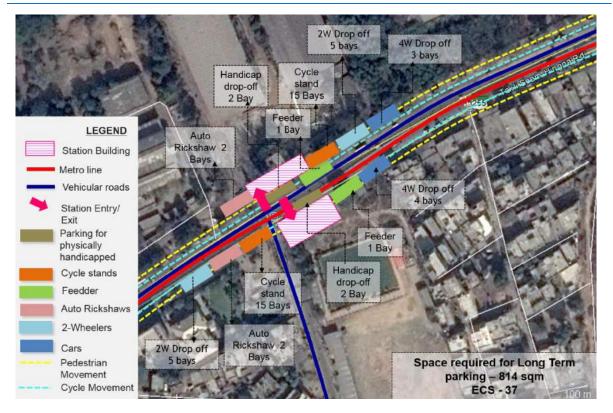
CONCEPTUAL LOCATION OF PICK AND DROP, PARKING FACILITY
